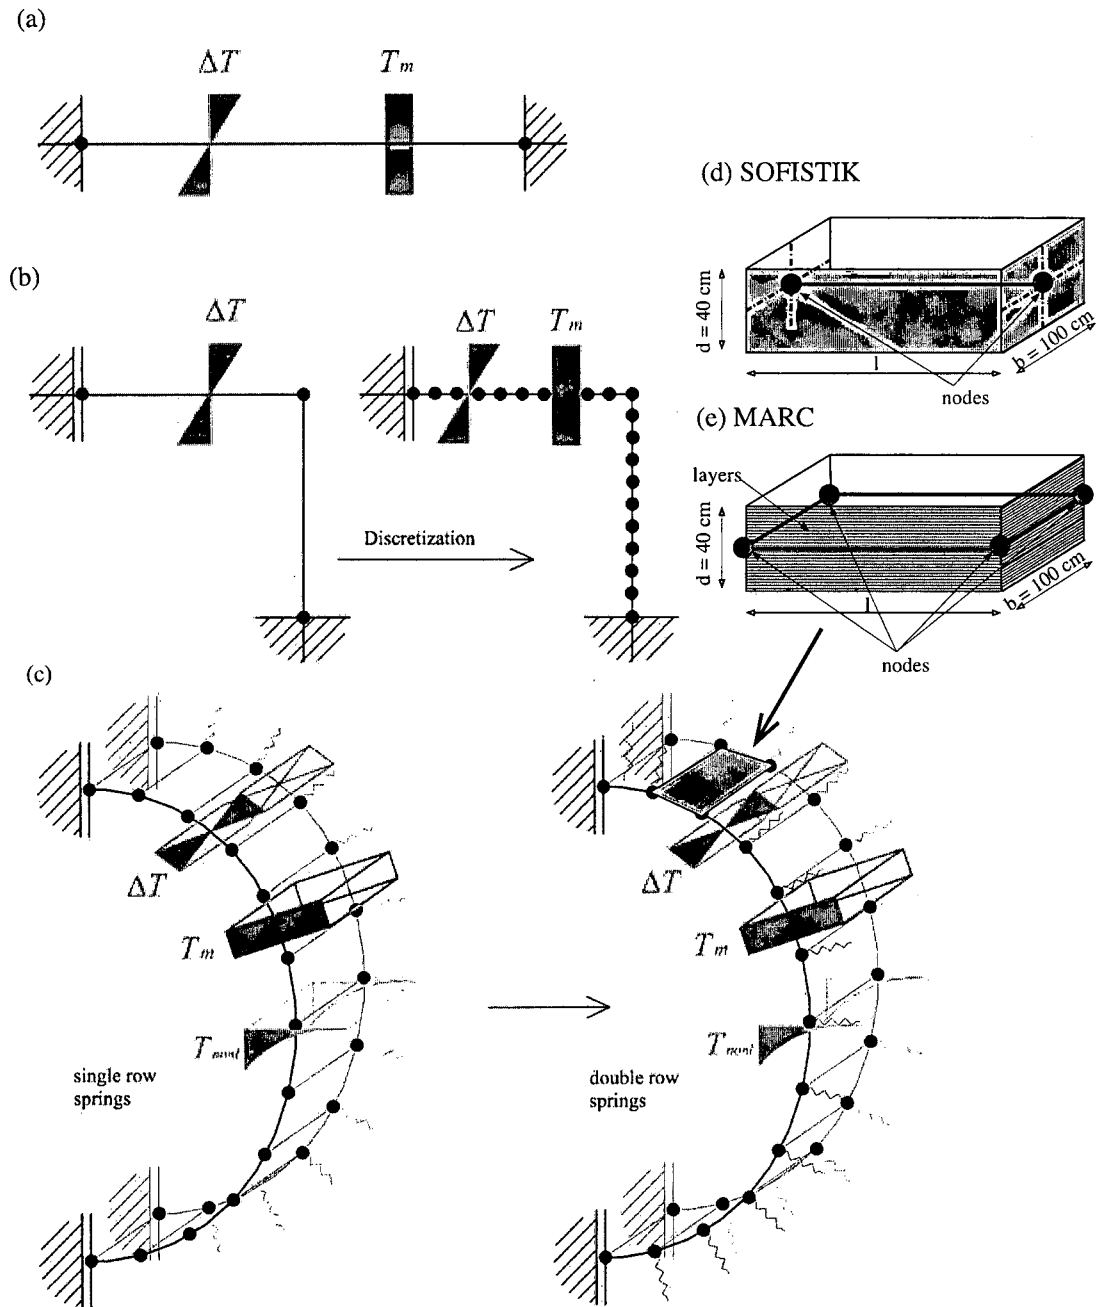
Considered structural systems: (a) clamped beam, (b) clamped frame corner, and (c) tunnel cross-section; Finite elements used in analyses: (d) beam element (SOFISTIK) and (e) shell element (MARC)
